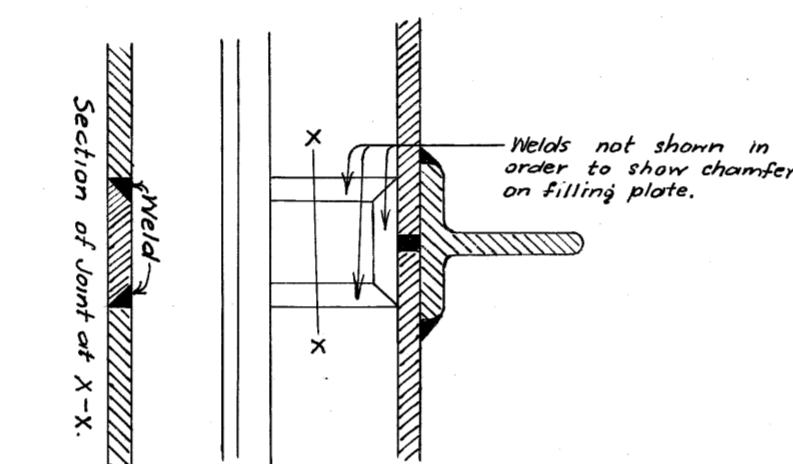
DETAILS OF LOWER PORTION OF LOWER TANK WALL & COLUMN.
